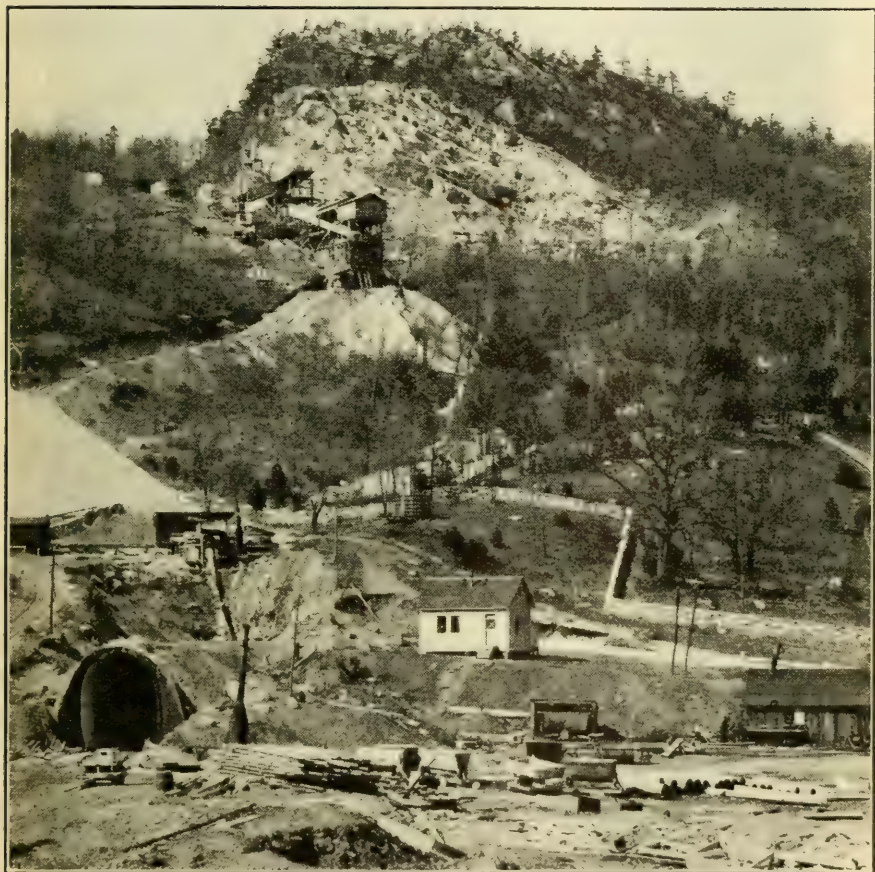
RONDOUT PRESSURE TUNNEL EMERGING BELOW BONTECOU CRAG, ON EASTERN SLOPE OF SHAWANGUNK MOUNTAIN.
